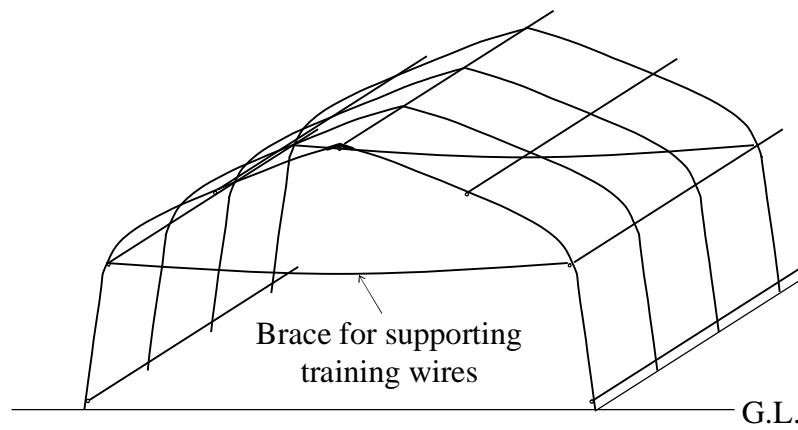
Pipe house attached braces for supporting training wires: the end of brace was fastened at the straight pipes at each eaves of pipe house.
